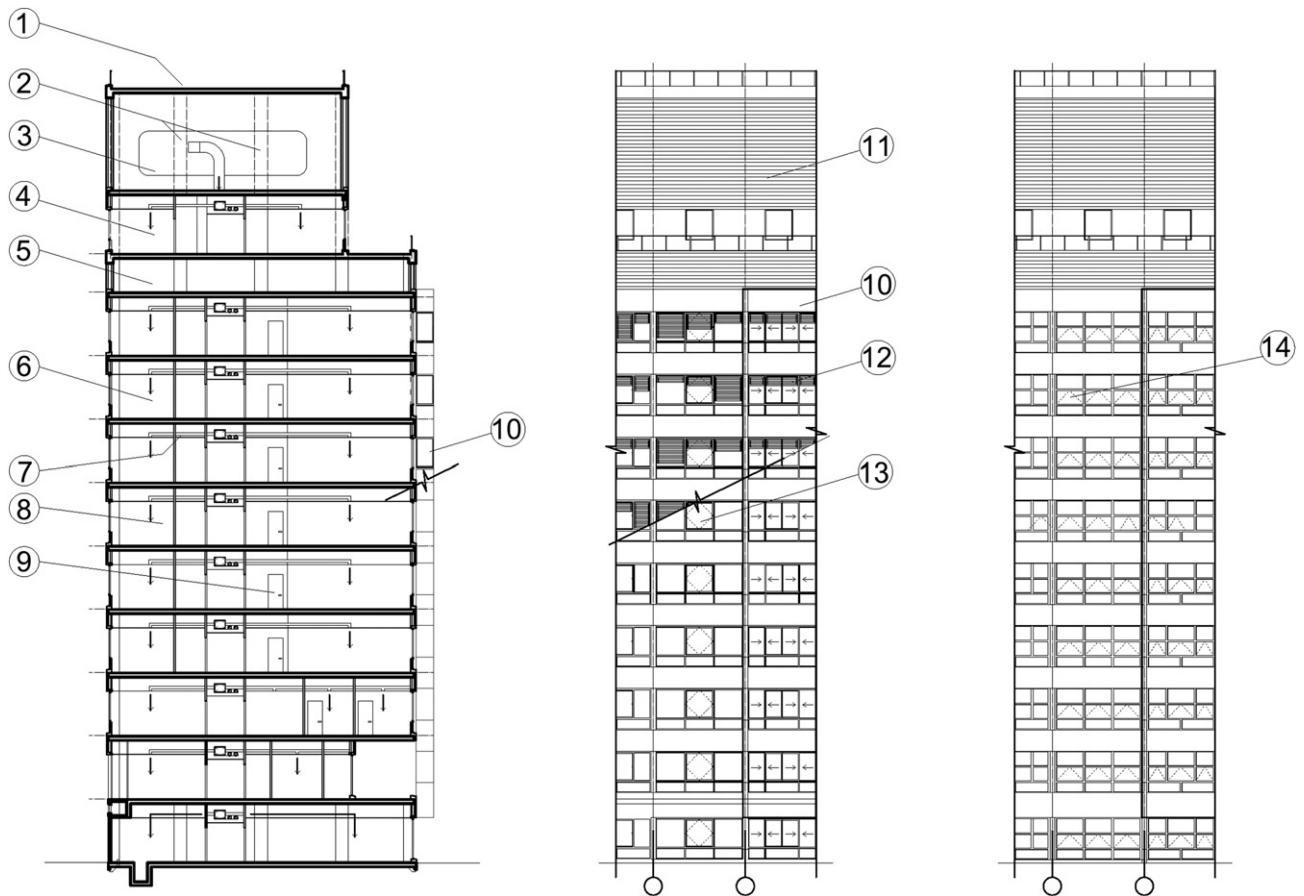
The Ward Tower, Addenbrooke's Hospital, as originally built (showing also omitted shading), and as modified by 2011. Key: 1 Uninsulated roof deck; 2 Concrete piers in place of cross walls; 3 Plant room: air handling units delivering warmed air throughout the Tower; 4 Upper floor designed as isolation ward for infectious patients; 5 Services distribution plenum, half floor; 6 Typical ward floor: small rooms to N, 4–6 bed wards to S; 7 Wards designed with perforated metal ceiling panels connected to LPHW pipework to provide radiant heating; 8 Warmed air ducted to wards; 9 Bathrooms mechanically ventilated; 10 Fully glazed projecting bays to 6 bed wards. Originally enclosed and highly cross-ventilated. Possibly to accommodate smokers; 11 Facing brick in concrete frame; 12 Original horizontal centre pivot opening windows, 1.1 m square, operated by occupants; 13 Refurbishment in 2004 substituted double glazed windows in aluminium frames, lower casements only openable, top-hung.
